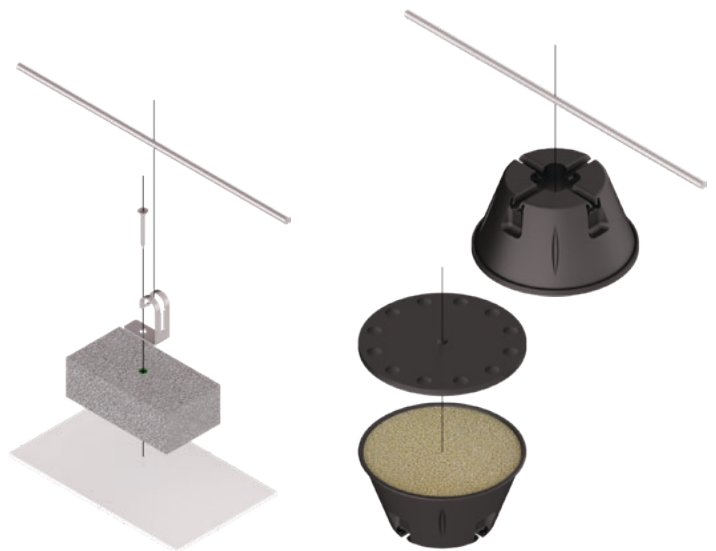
Installation of a suitable load-bearing element SON17, SON17 B on a flat roof covered with bituminous roofing or additionally covered with sand
